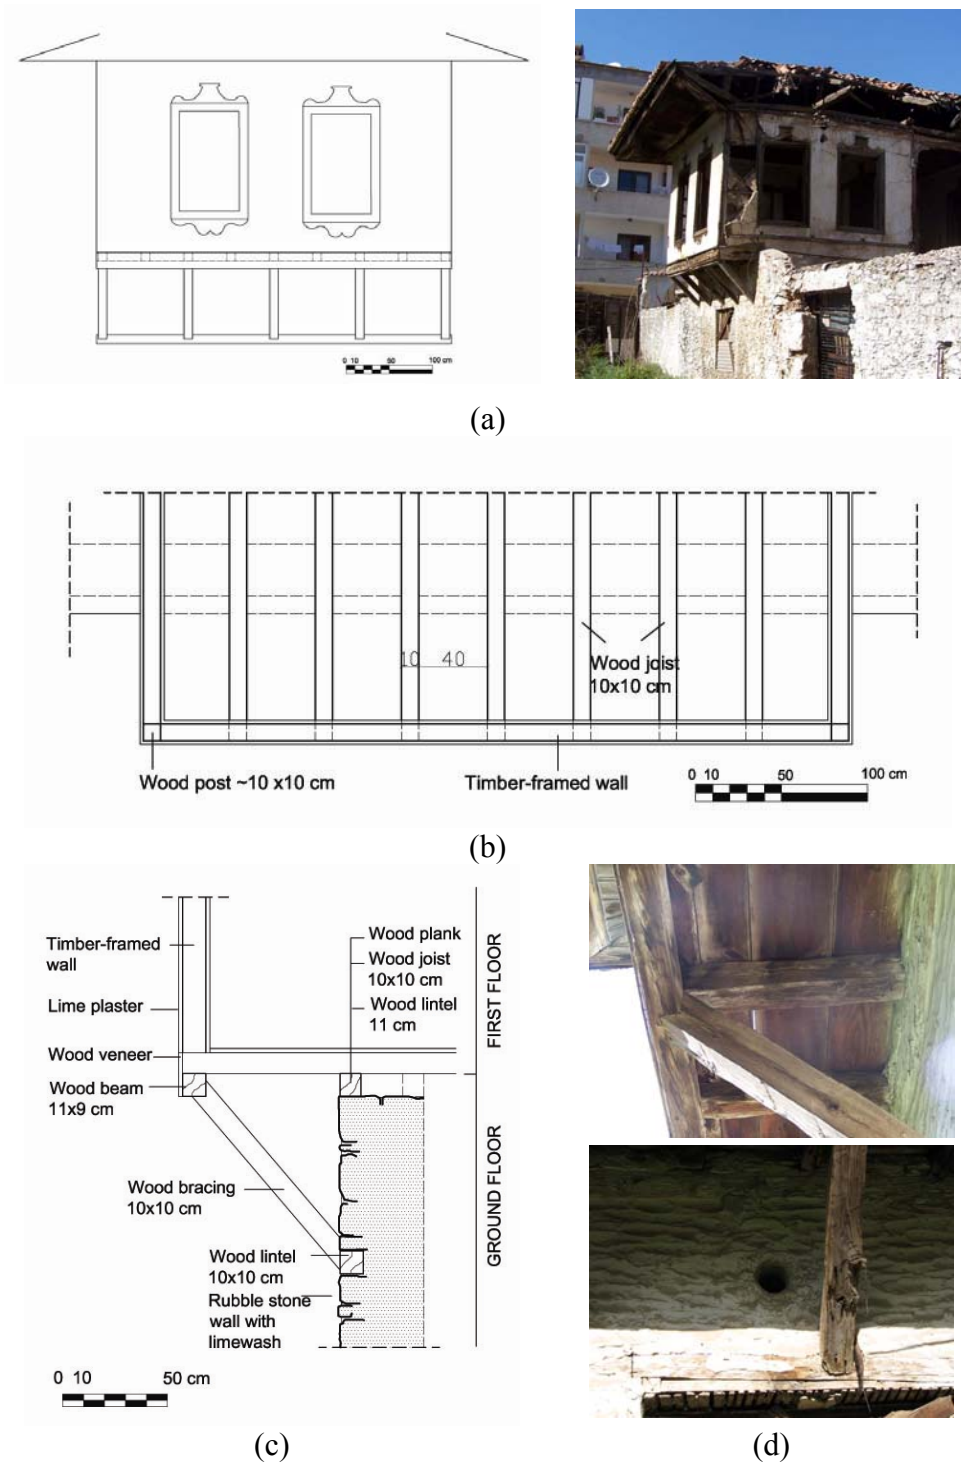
Cumba* supported with five wooden bracing; a. elevation, b. plan, c. section and d. close views (Üçler St. No: 6)
